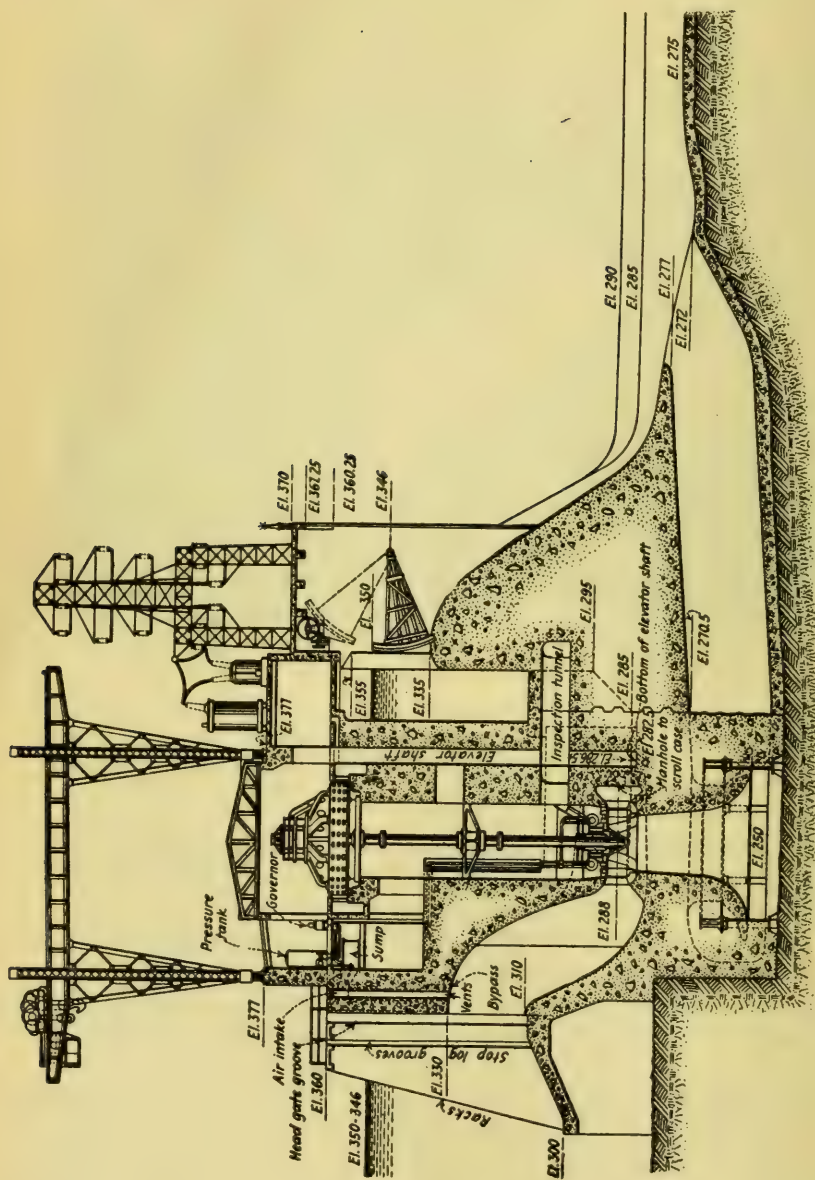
Cross-section through Power House of Alabama Power Company, Mitchell Dam, Showing Backwater Sup-
